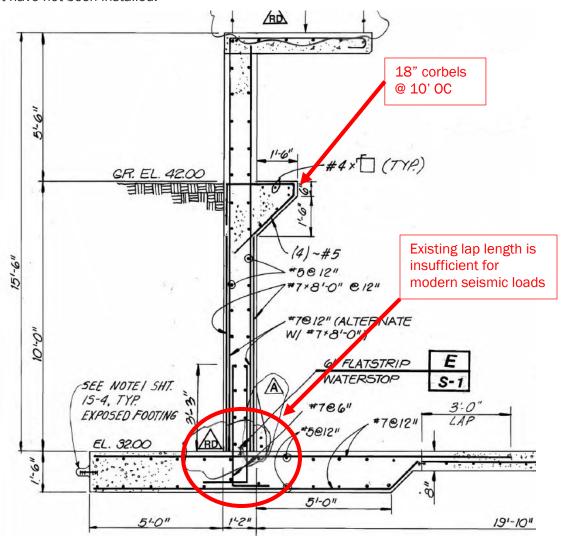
Typical Wall Reinforcement, Basins 3-6 Exterior and Interior Divider Walls
